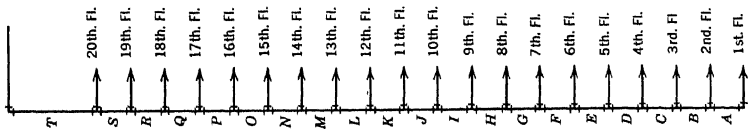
TYPICAL RISER FOR 20-STORY BUILDING
